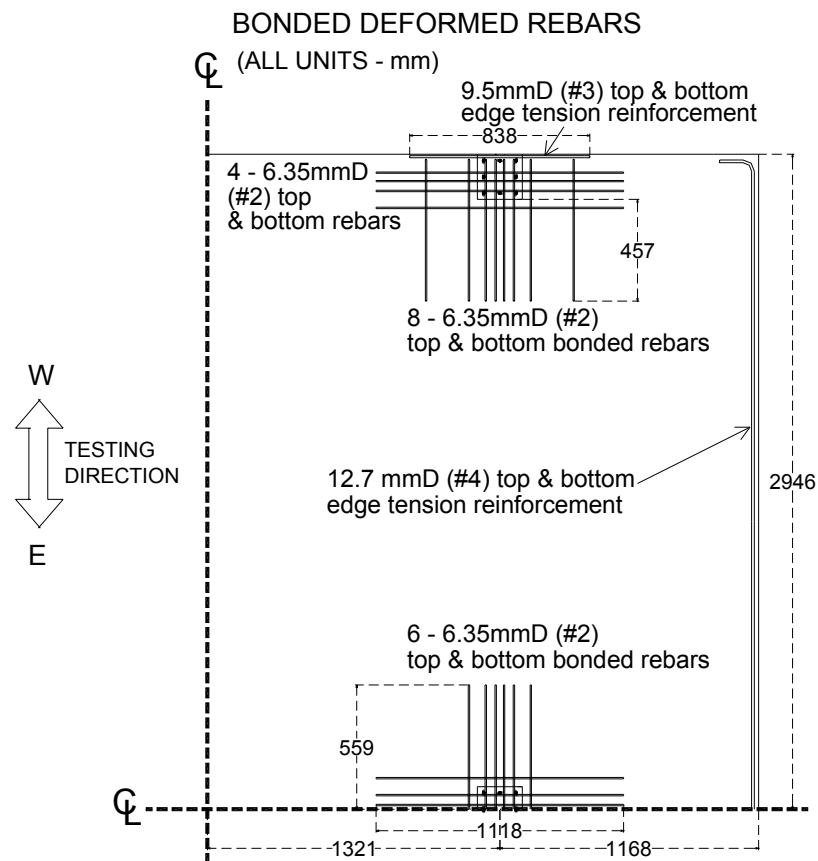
Details of bonded reinforcement (PT specimen)
